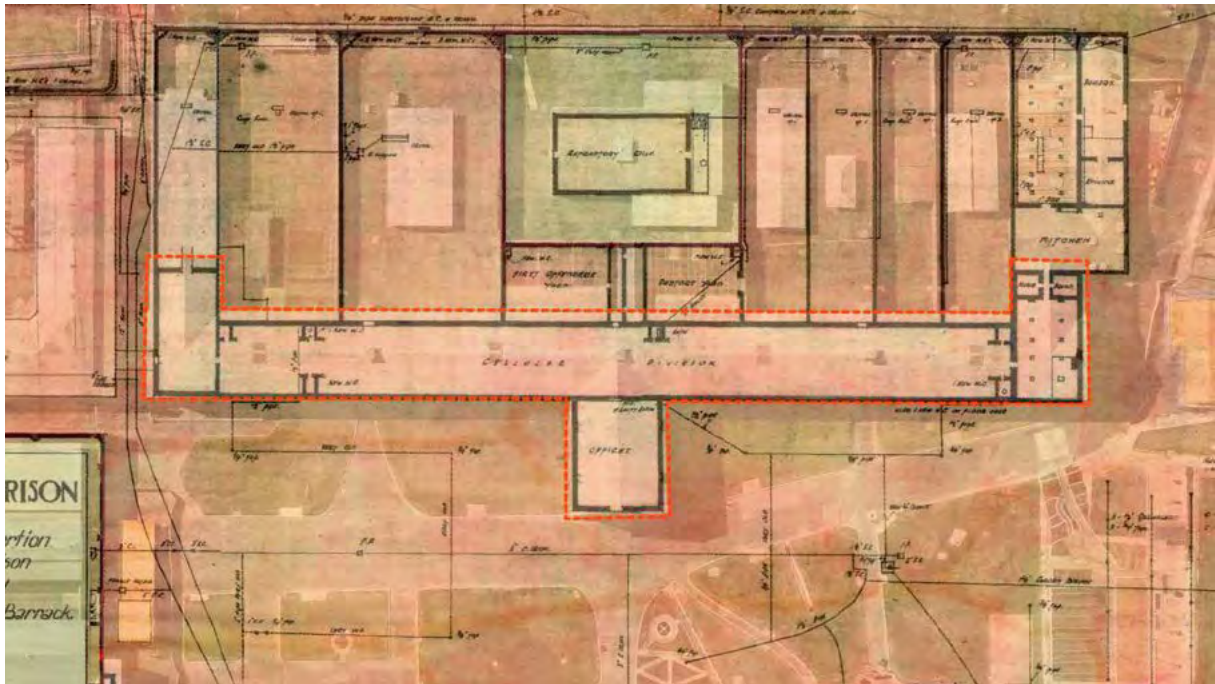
The 1922 plan shows additional internal details, but no significant structural changes are indicated.
